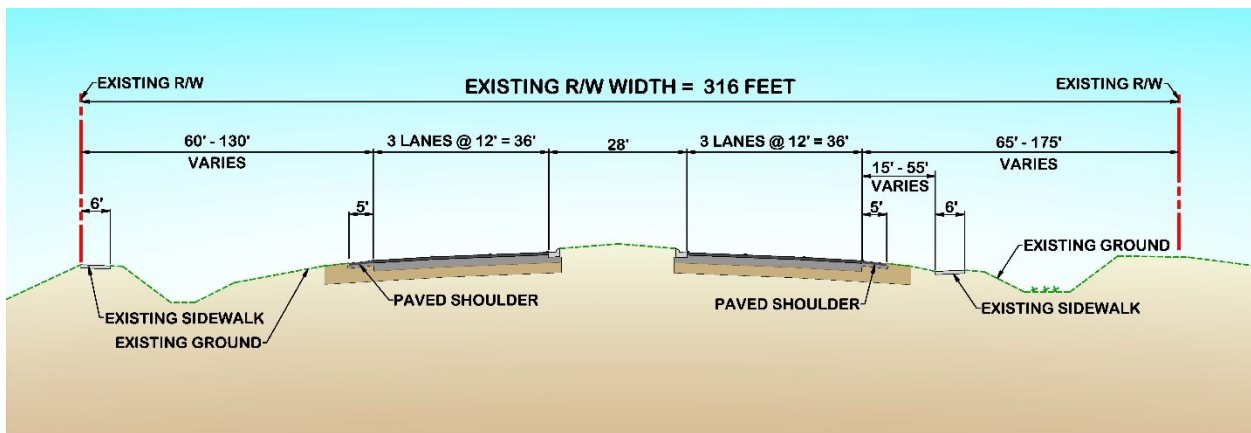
Existing SW 10<sup>th</sup> Street Typical Section – Quiet Waters Business Park Entrance Road to Military Trail
